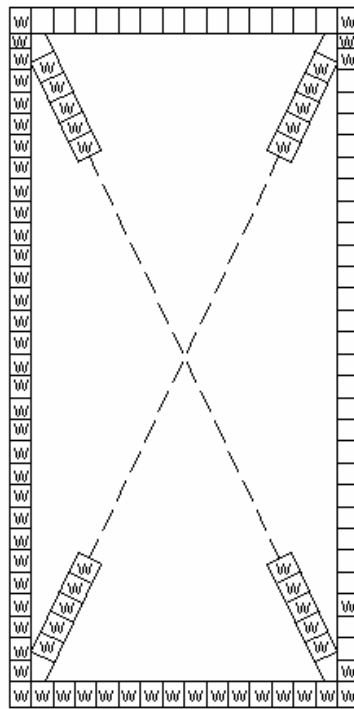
Sheathing nail failure modes for Wall A7.
